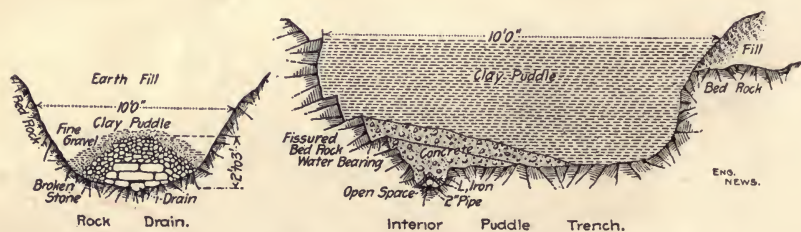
DETAILS OF BED ROCK DRAINS AT THE TABEAUD DAM.
